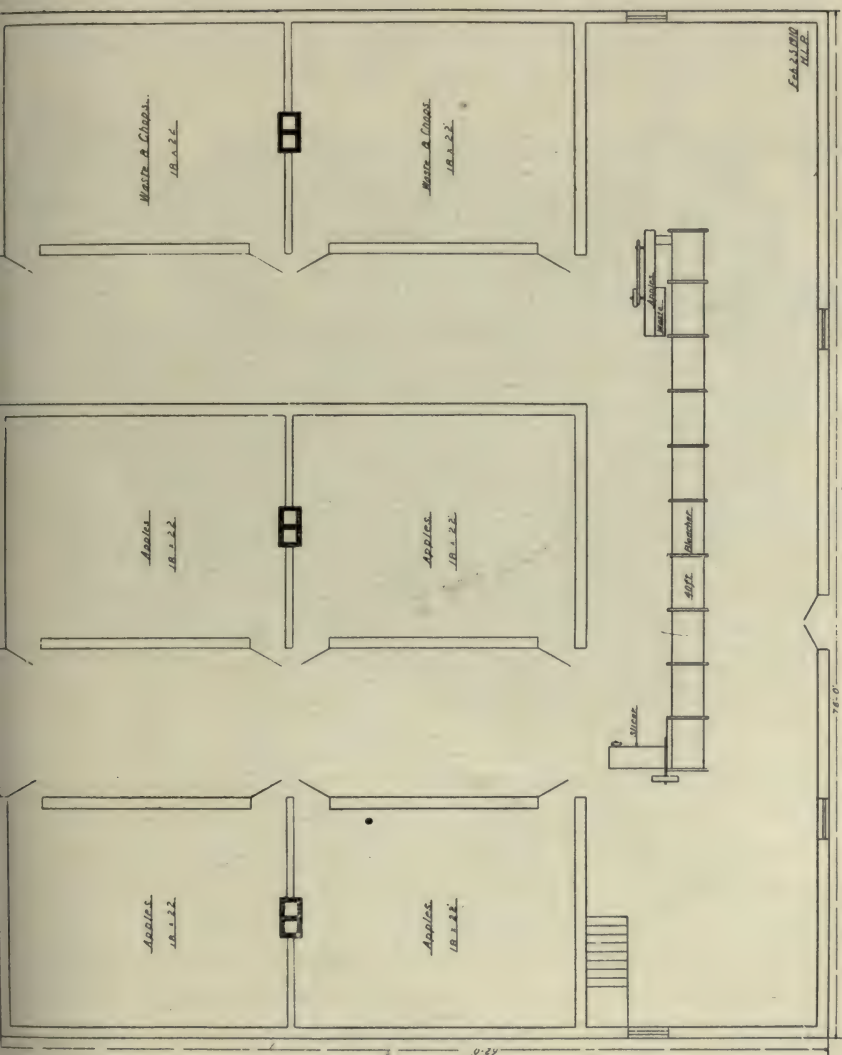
SECOND FLOOR PLAN OF SIX-KILN EVAPORATOR, SHOWING BLEACHER
